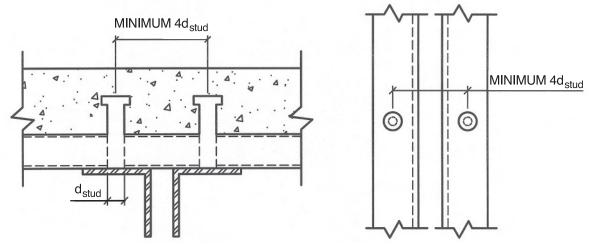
MINIMUM TRANSVERSE SHEAR STUD SPACING
